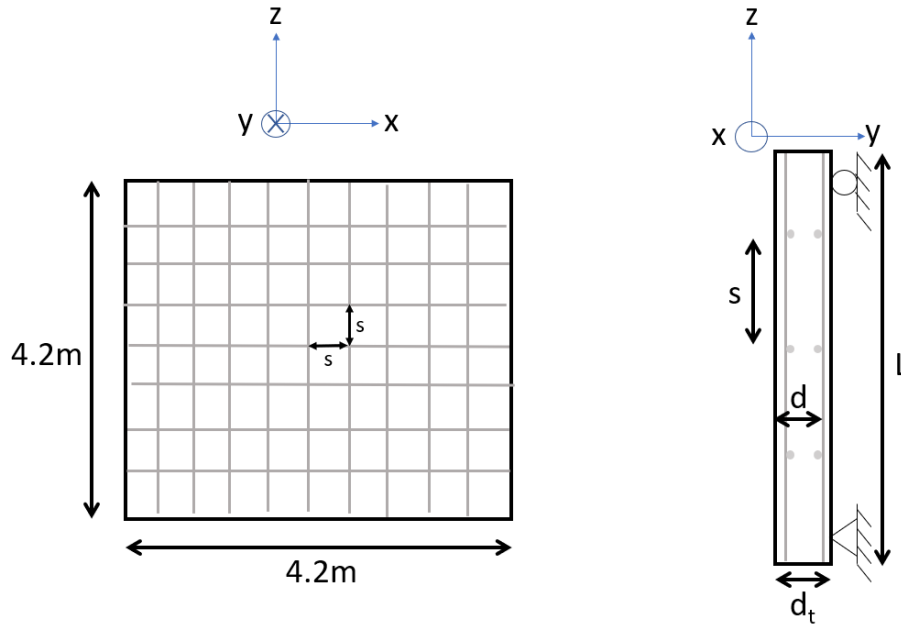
Sketch of the steel reinforcement (gray) in the wall. Not to scale
